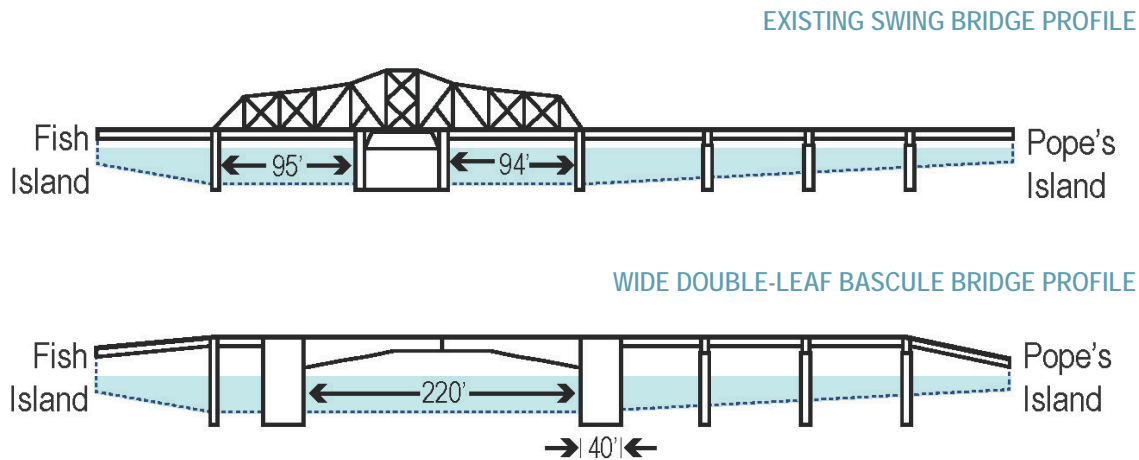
Alternative 2W: Wide Double-leaf Bascule Bridge Plan
